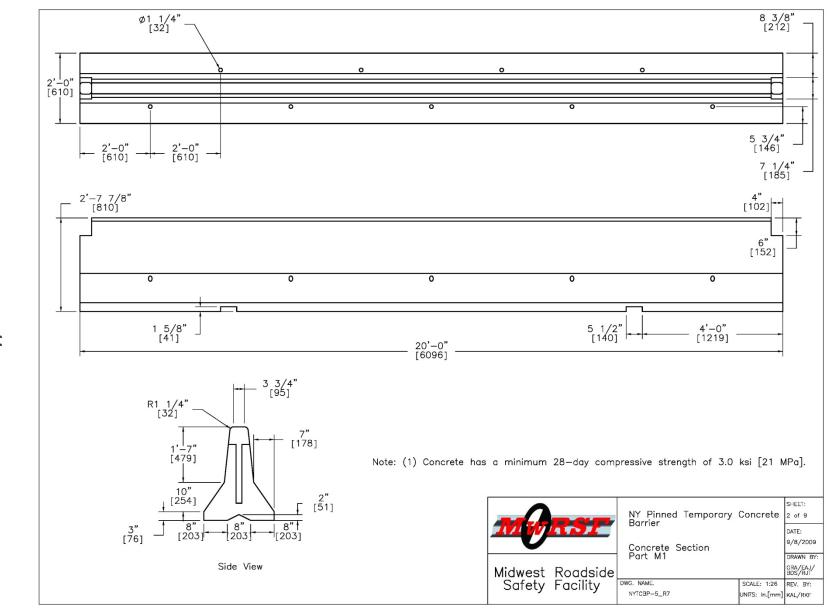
Temporary Concrete Barrier Details, Test No. NYTCB-5
